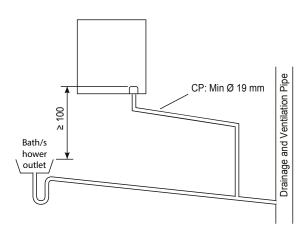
Connection of Condensing Water Drainage Pipe to Bottom Level of Interior Bath Outlet Siphon
